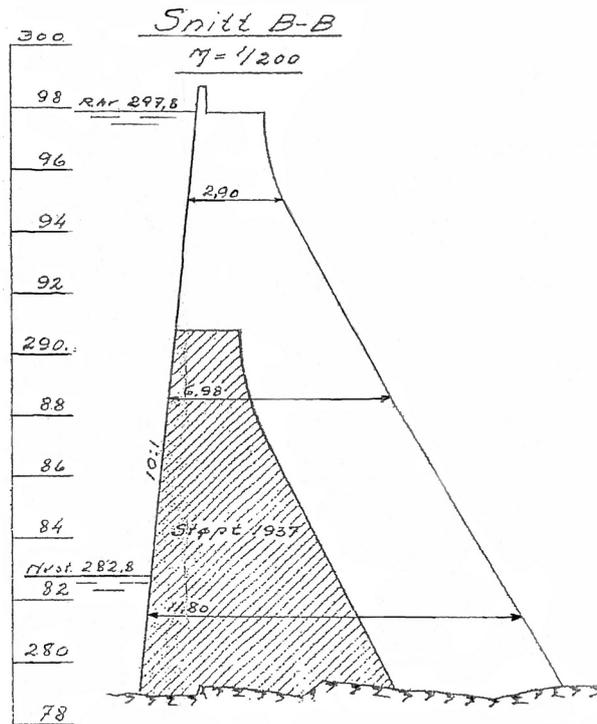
Cross-section through the dam at maximum height. The shaded area indicates the profile of the original dam constructed in 1937
